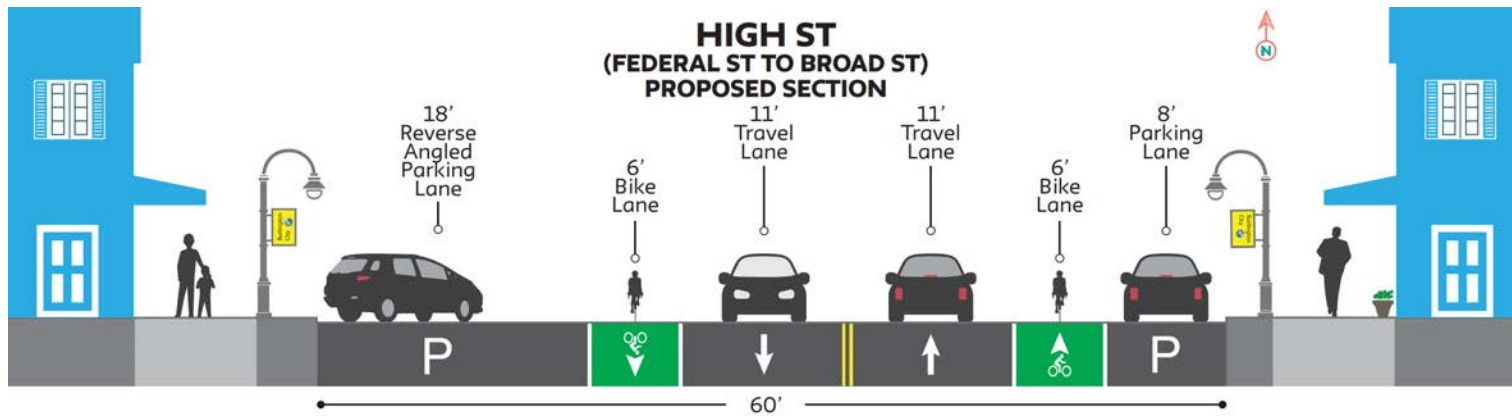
Proposed Cross Section High Street - Federal Street to Broad Street
